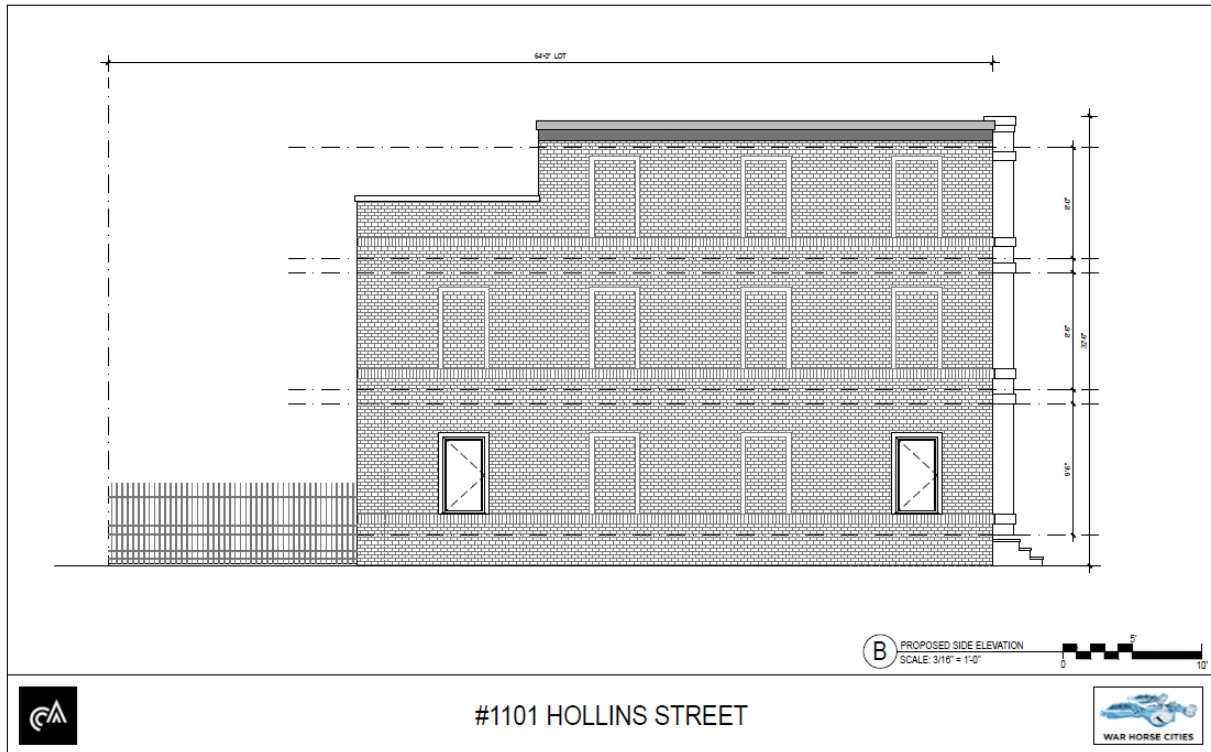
1101 Hollins Street, Arlington Avenue elevation
